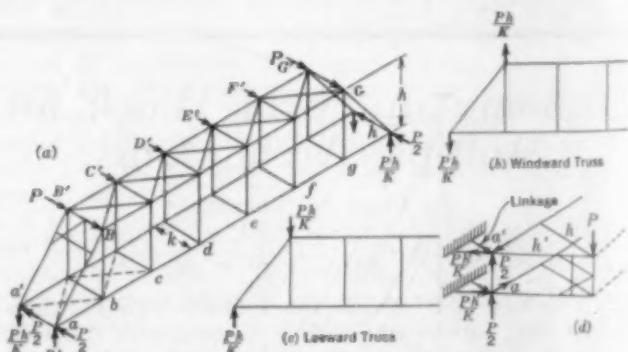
SHOWING TRANSFER OF WIND STRESSES IN TYPICAL BRIDGE TRUSS
